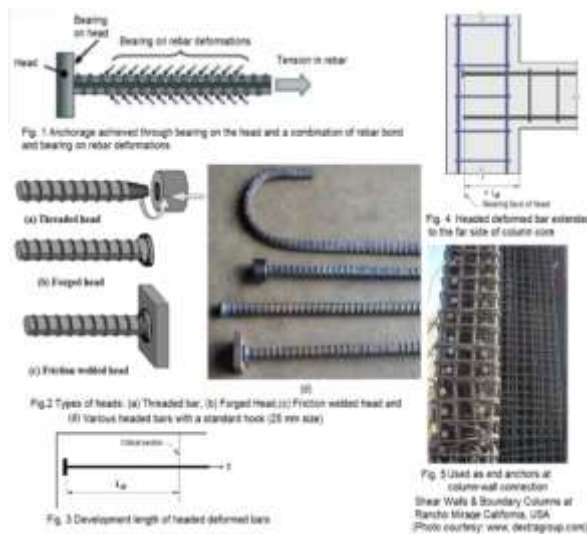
Types of heads: (a) Threaded bar, (b) Forged Head, (c) Friction welded head and (d) Various headed bars with a standard hook (25 mm size)
